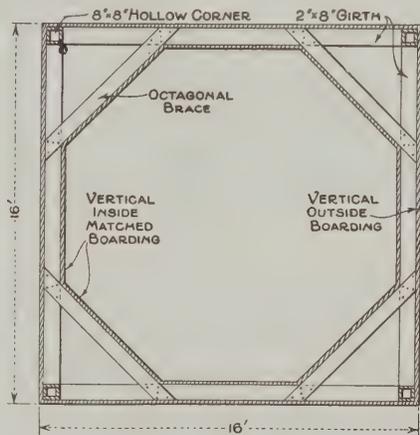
Plan of the Framing—Scale $\frac{1}{4}$ In. to the Foot
